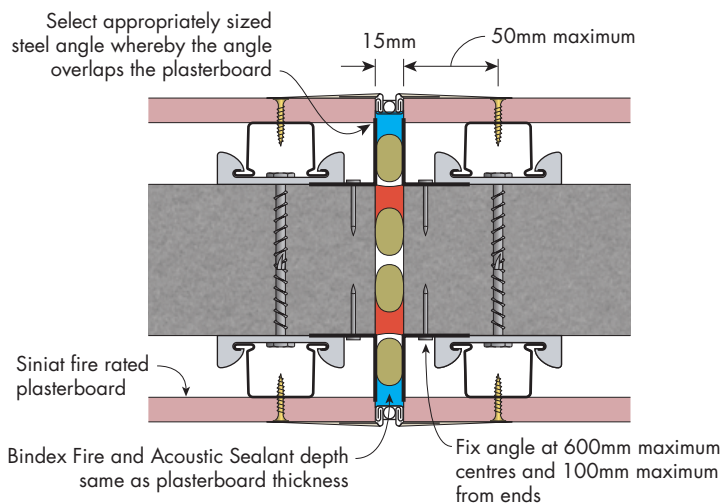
Typical Internal Masonry Separating Wall to Brick Veneer
